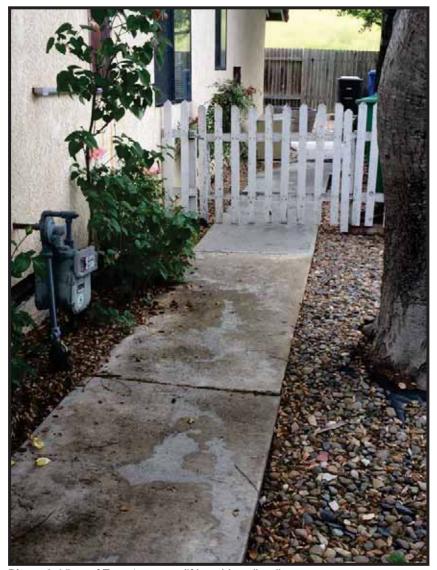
View of Tree 1 roots uplifting sidewalk adjacent to gas meter.
